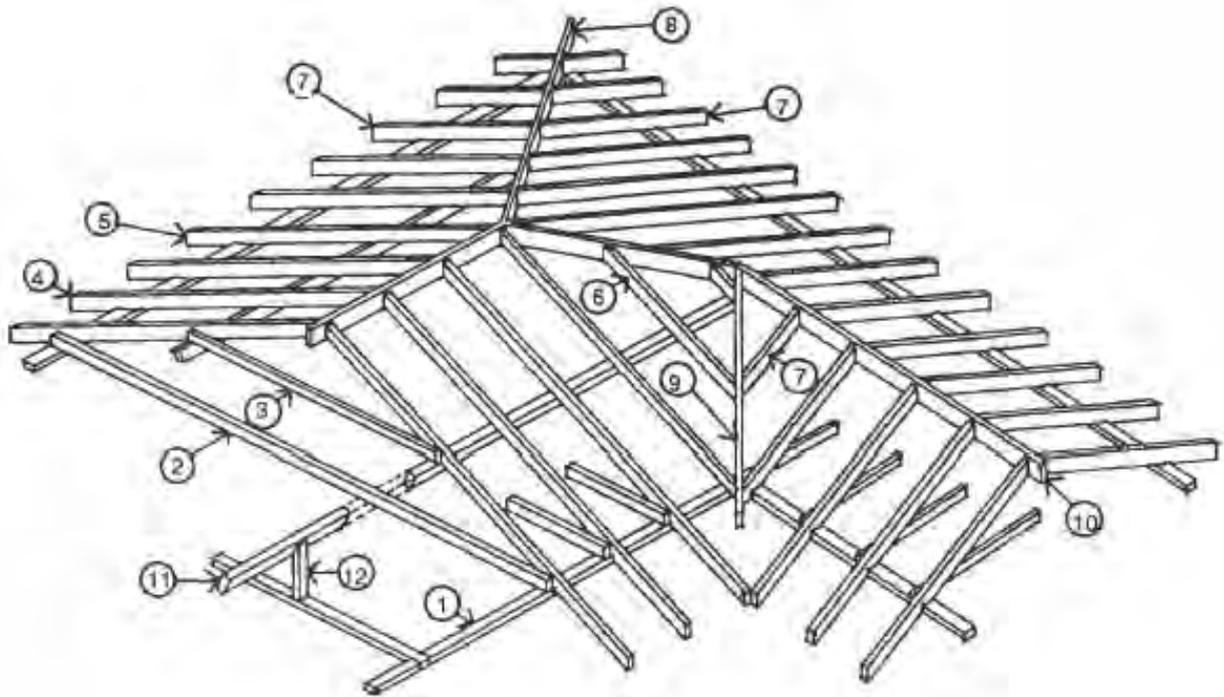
GENERAL FRAMING DETAILS FOR TIMBER HOUSES
